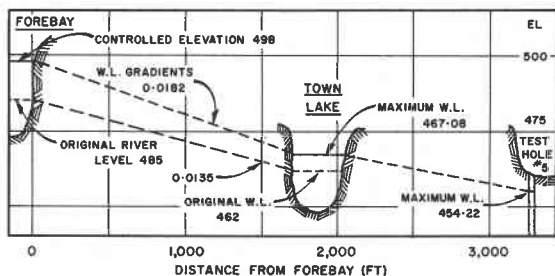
CROSS-SECTION FROM THE LA TUQUE HEAD POND TO THE OBSERVATION PIPES BELOW THE POWER HOUSE
